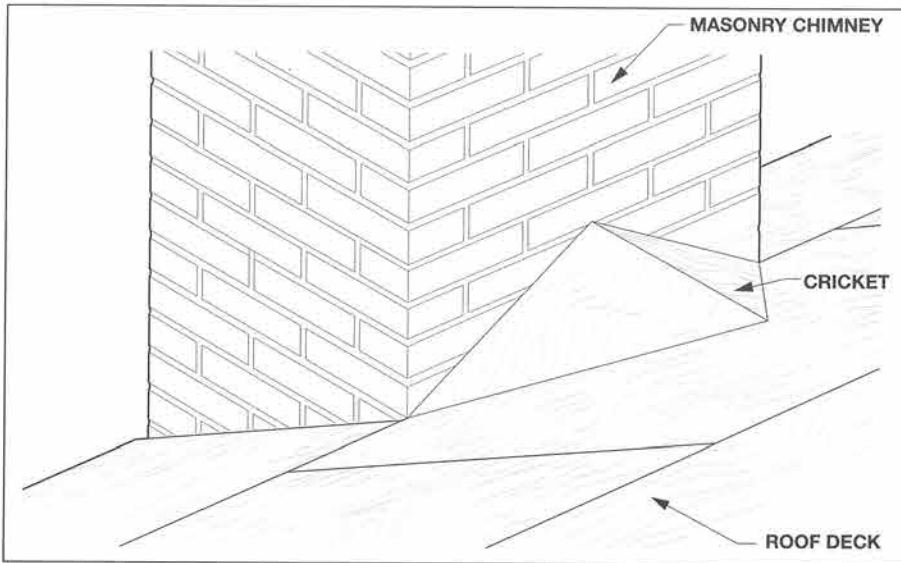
Example of a wood cricket built on the upslope side of a chimney
